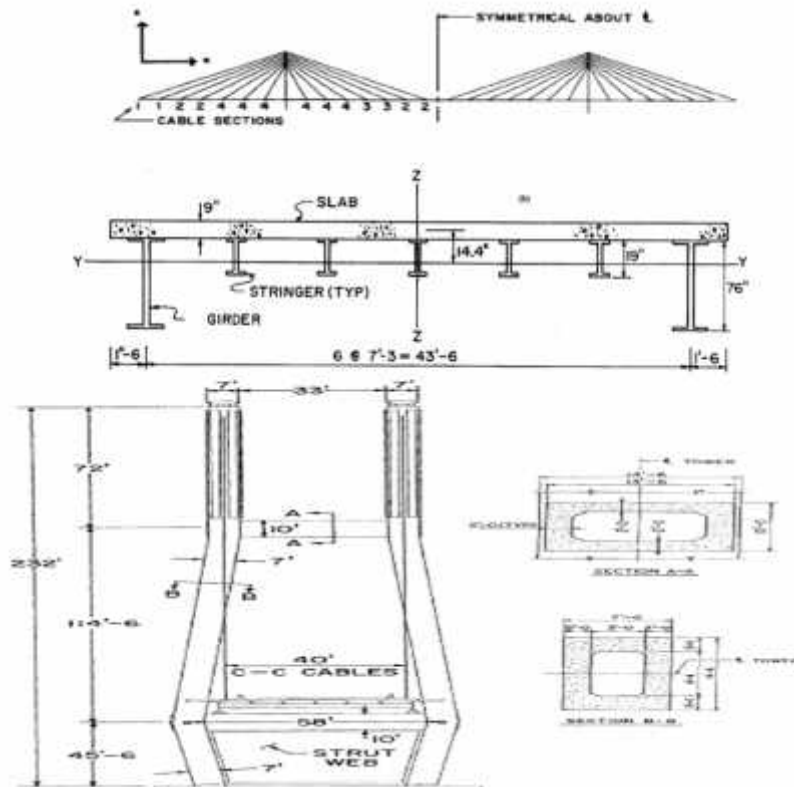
Elevation, c/s& cable system of Quincy Bay View (Type I)^[5]
